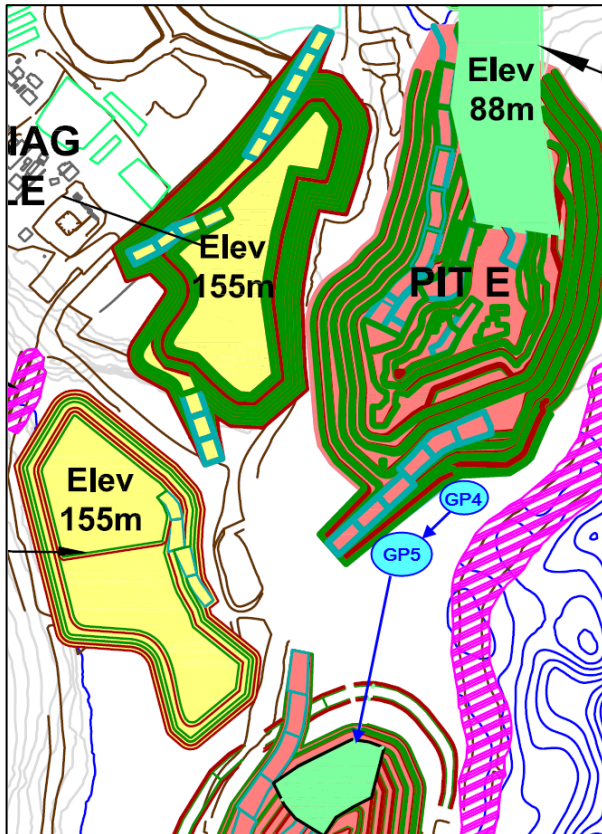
View of Portage Pit E area with the associated sumps and trenches
